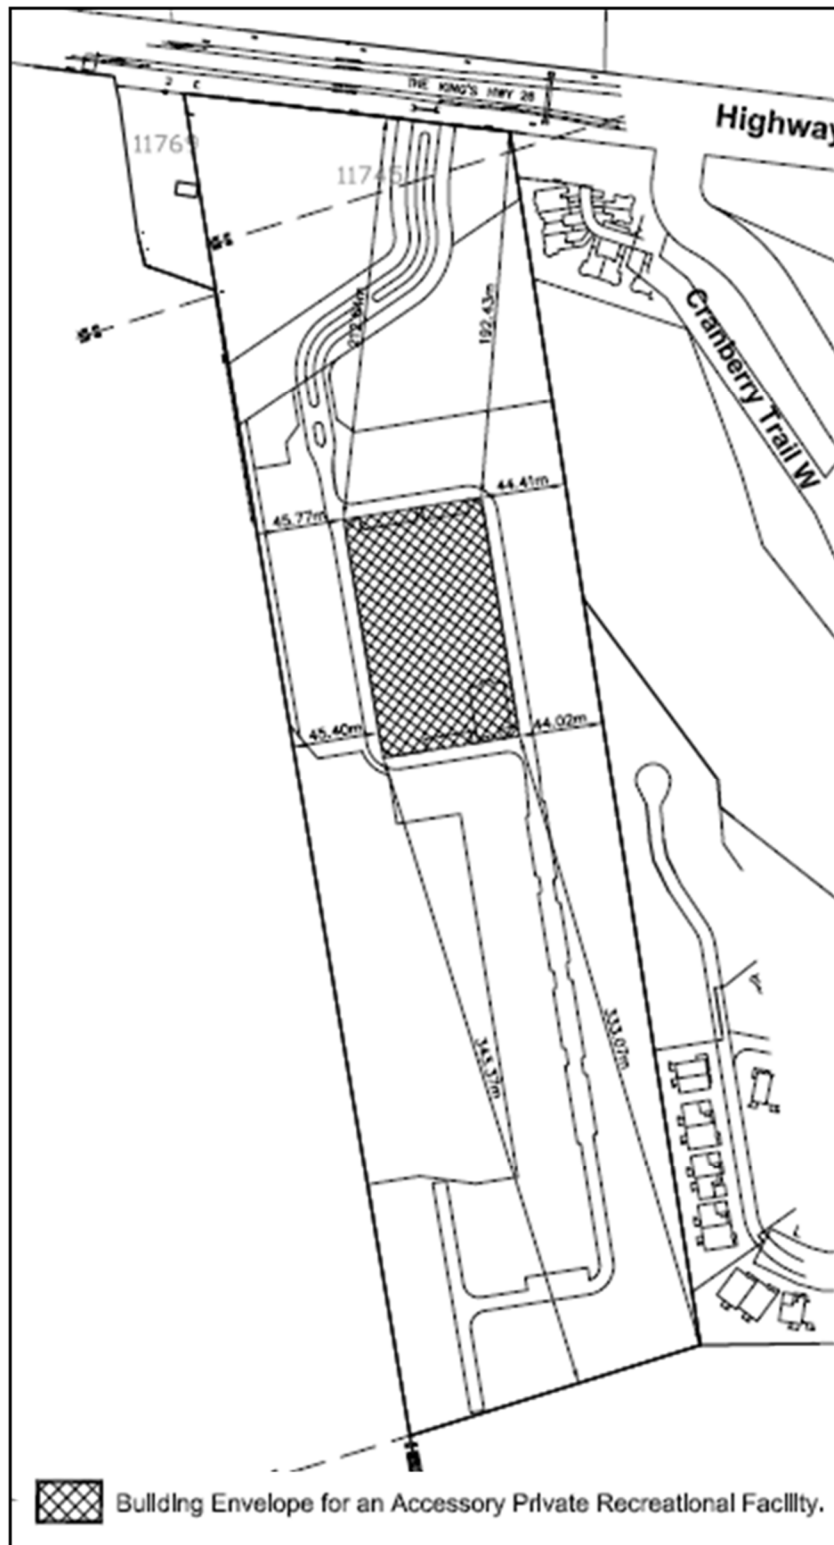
R3-21 zone requirements for the accessory private recreational facility
